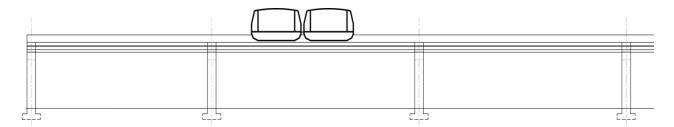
Conceptual Illustration of a PRT System on an Elevated Guideway
